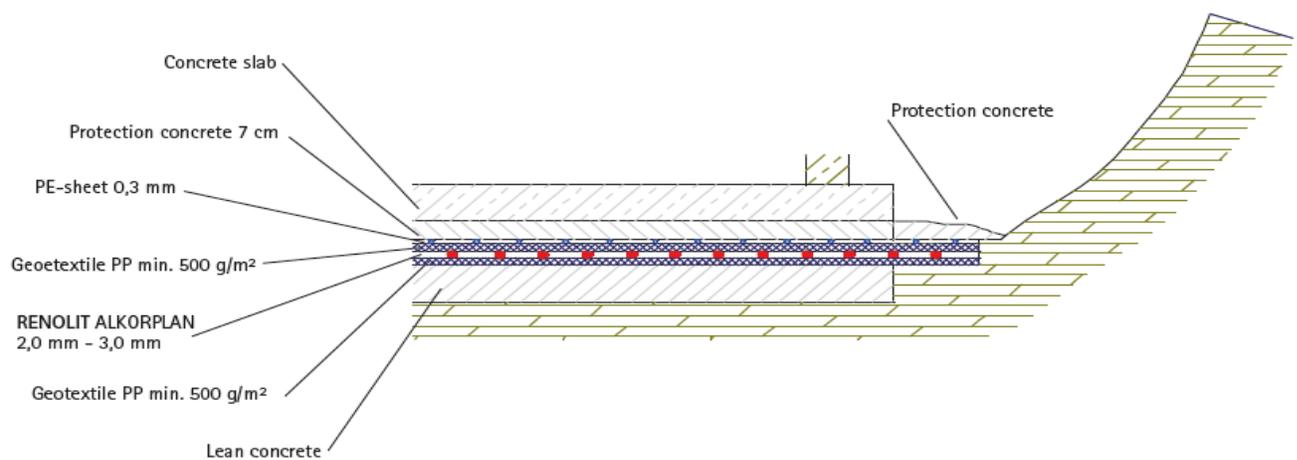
Waterproofing of bottom slab with working space<sup>[16]</sup>
